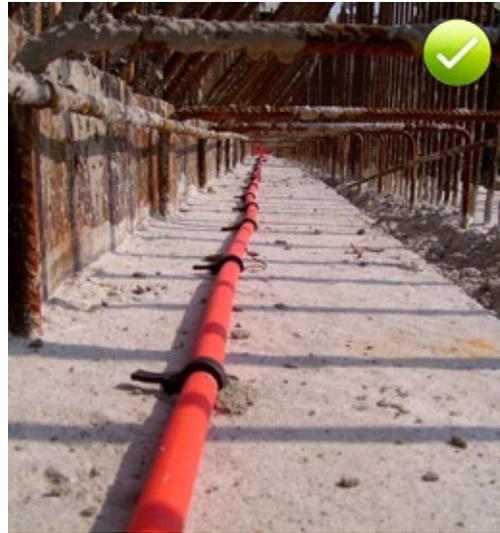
SikaFuko®VT and SikaFuko®ECO injection hose in a construction joint
